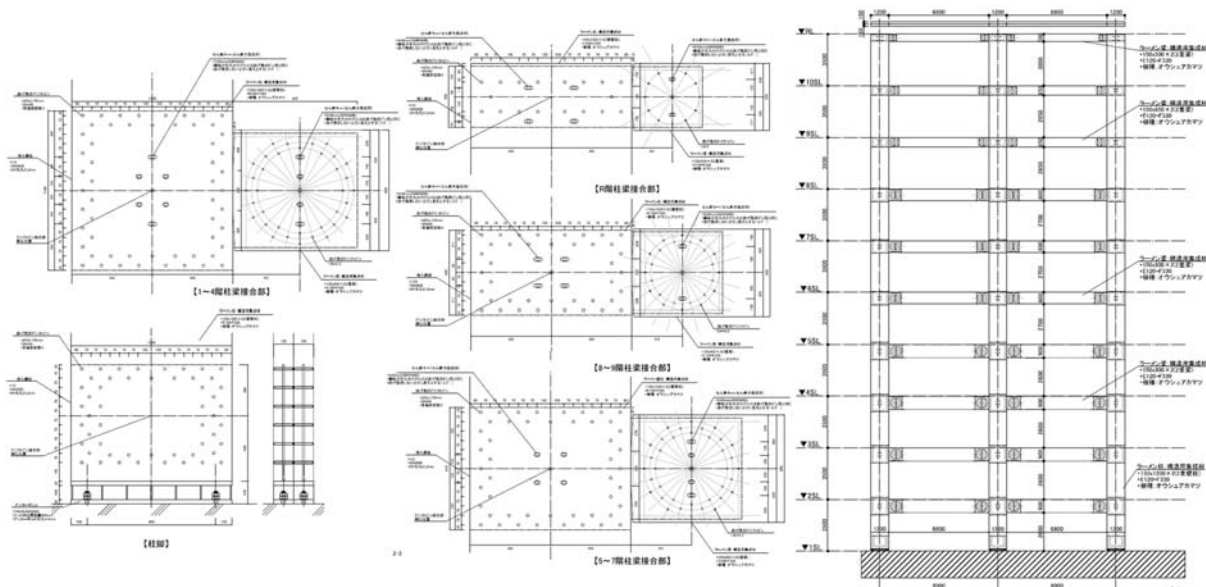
Trial design of 10-story wooden building presented in 2021 AIJ. (Akiyama, 2021)
